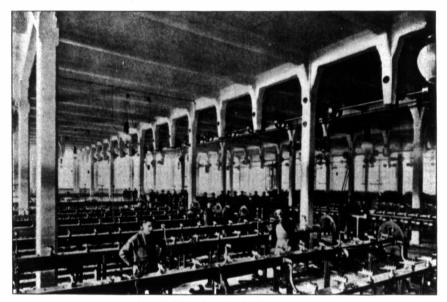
Perfect Fireproof Mill Construction. Full entirely of Commit Concrete Floors, Walls, Posts, Bennis, Hermitian, System, Prance,
